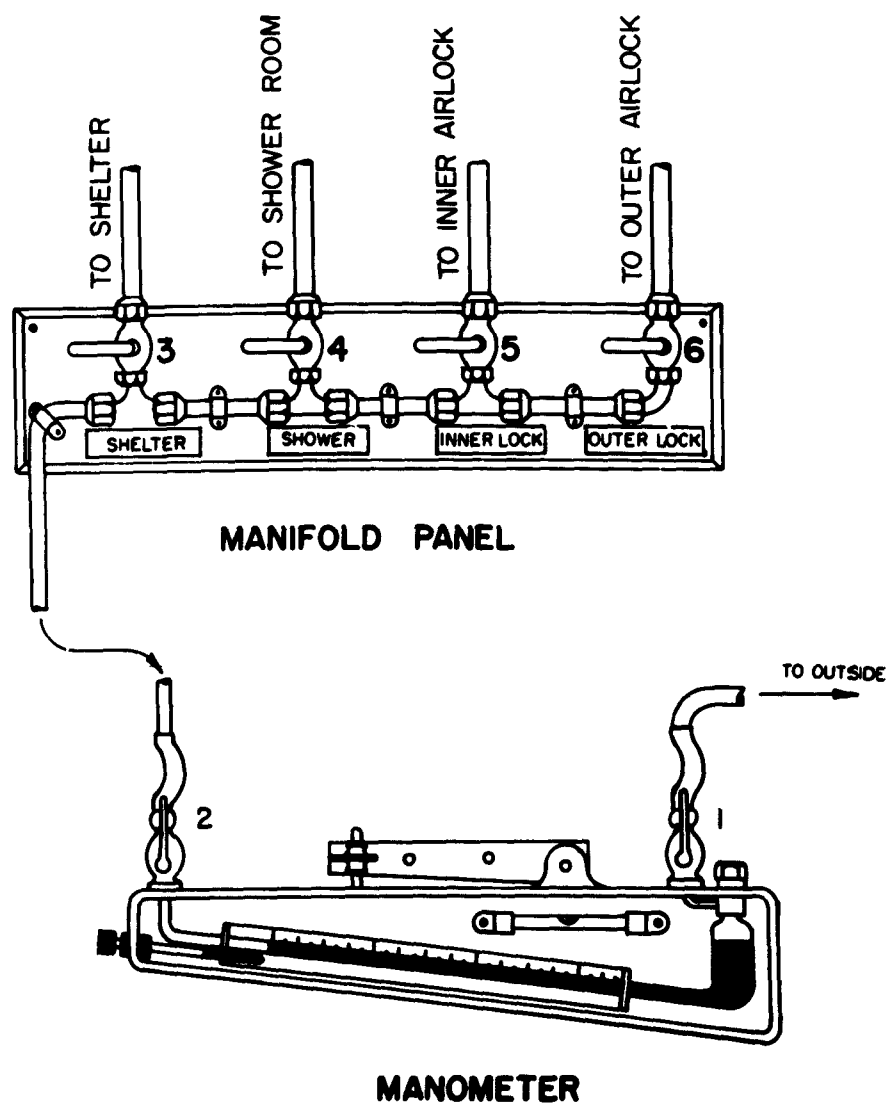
Manometer and manifold arrangement for shelter pressure tests.
